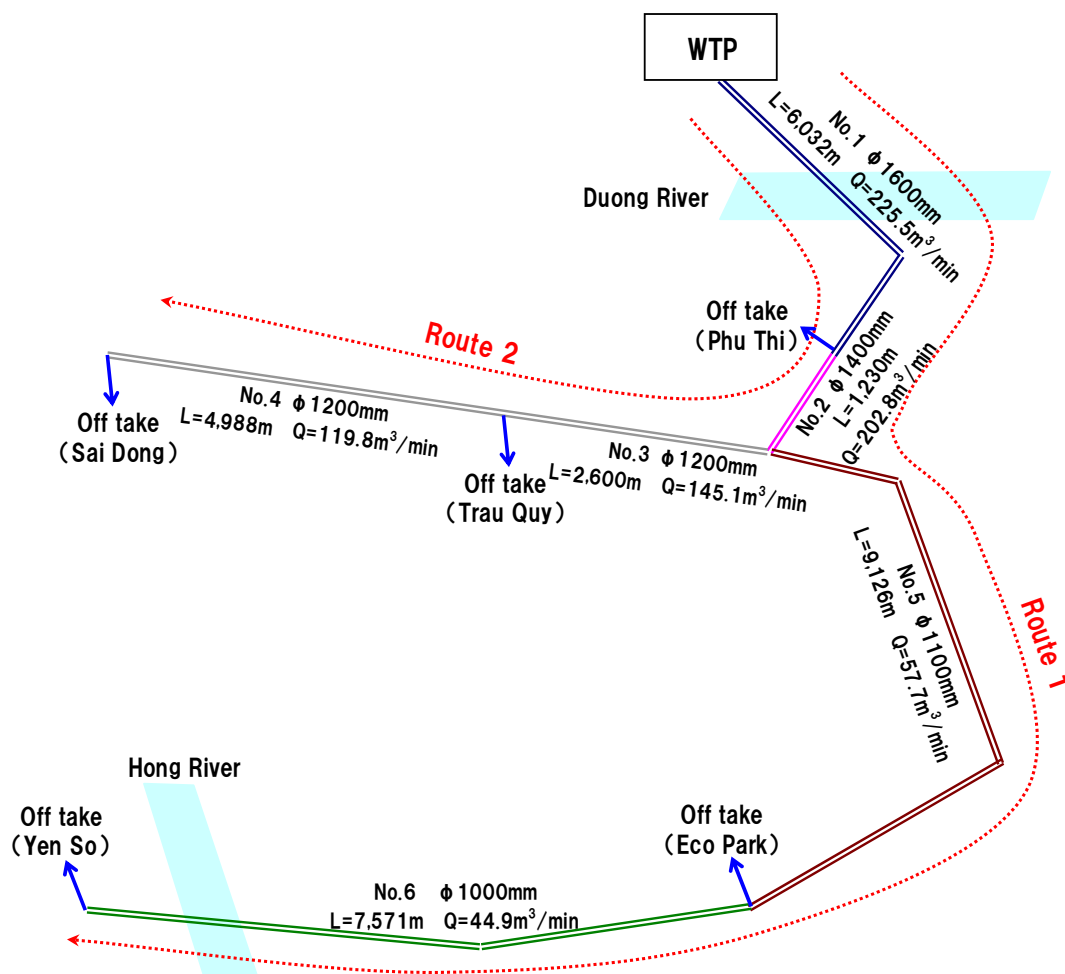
Schematic Layout of Water Transmission Pipeline (South)
